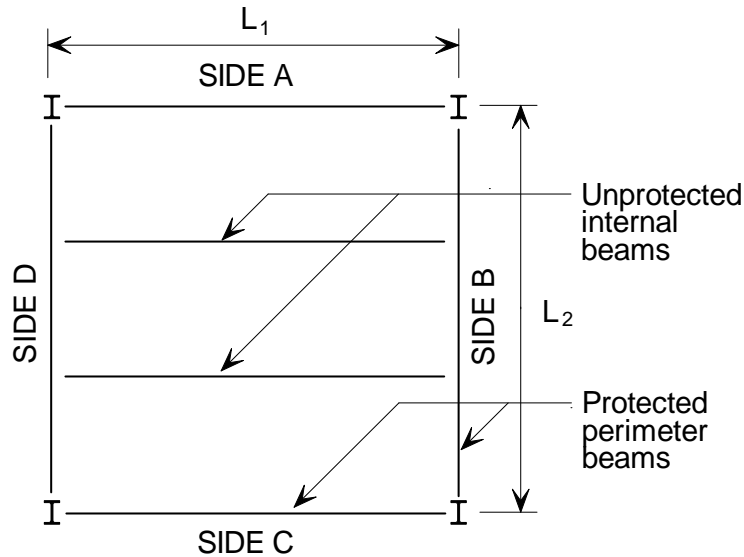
Definition of span 1 (L_1) and span 2 (L_2) and the beam layout for a floor design zone in a building requiring fire resistance of 60 minutes or more.
